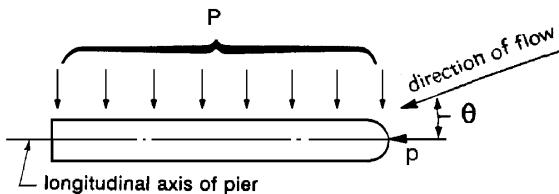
Plan View of Pier Showing Stream Flow Pressure
